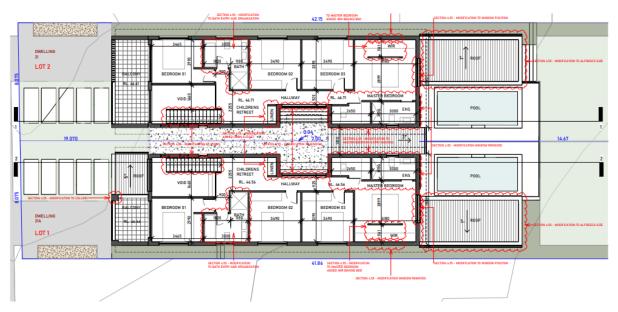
Proposed modified ground floor plan showing amendments to the development, notably the reduction of the internal courtyards between the dwellings.
